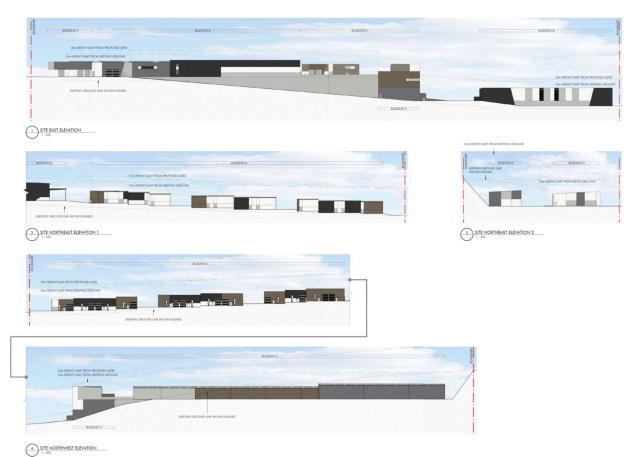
Precinct F Representative Elevations – As Proposed (Source: Nettleton Tribe)
